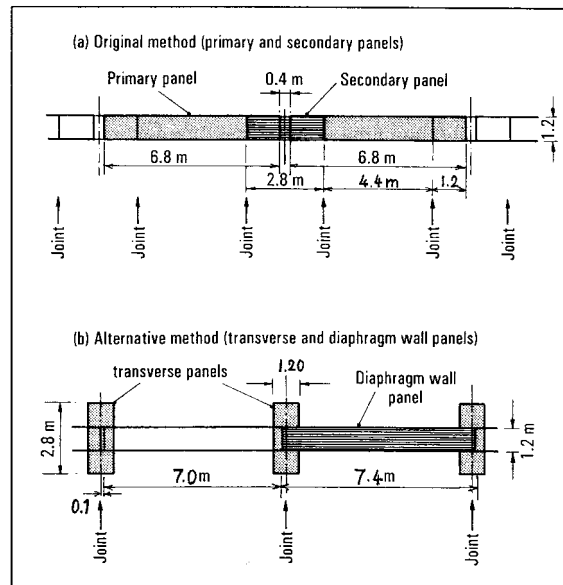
Slurry trench diaphragm wall: (a) original concept with primary and secondary panels; (b) actually applied method with transverse and diaphragm wall panels (Godde, 1998)
